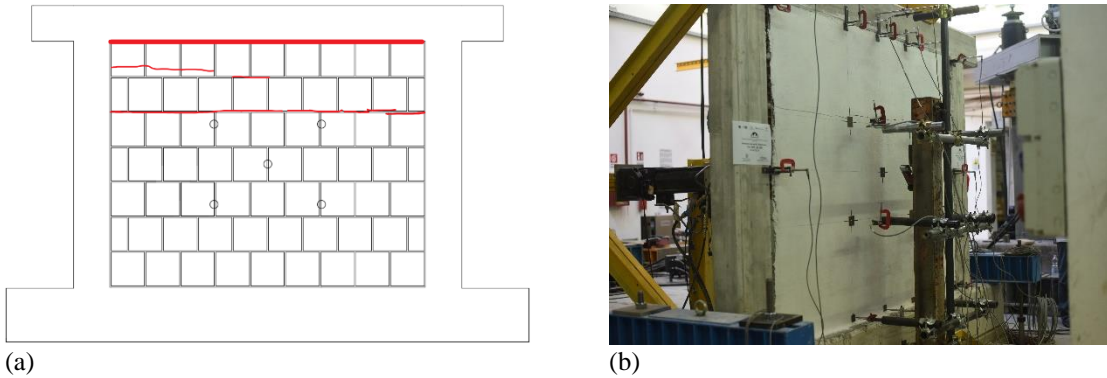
Specimen OOP_2E_RG at the end of the test: (a) cracking pattern, (b) photograph.
